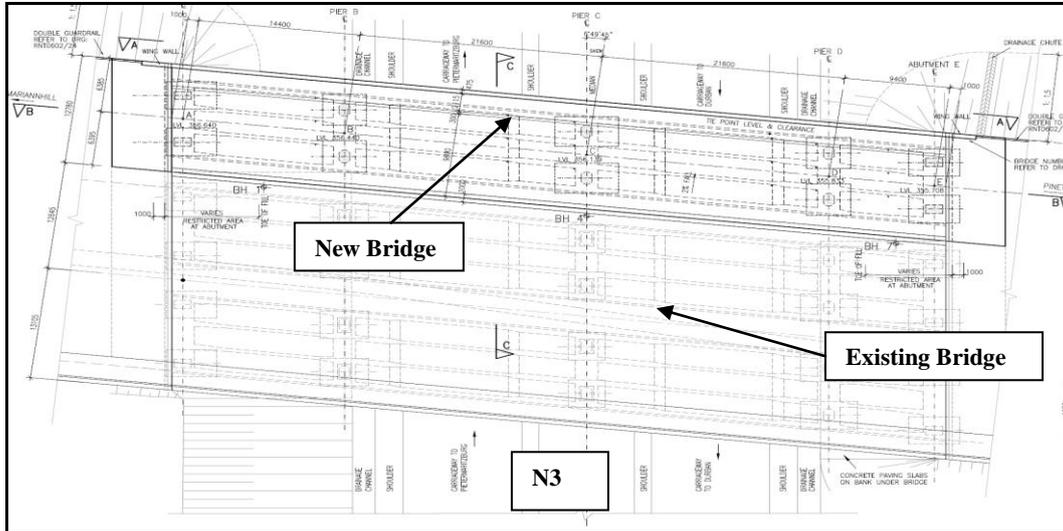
Plan View of the Richmond Road Interchange Bridge Site (SANRAL Contract N003-010-2008/1, 2008)
